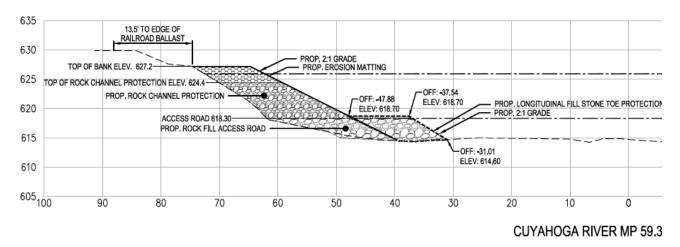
Selected alternative, typical construction-drawing section of the proposed armoring treatment. Note that 2 feet of fill above the rock armoring will be planted and is considered the bioengineering section of the armoring. The armoring extends 45 feet from the top-of-bank out into the river.
